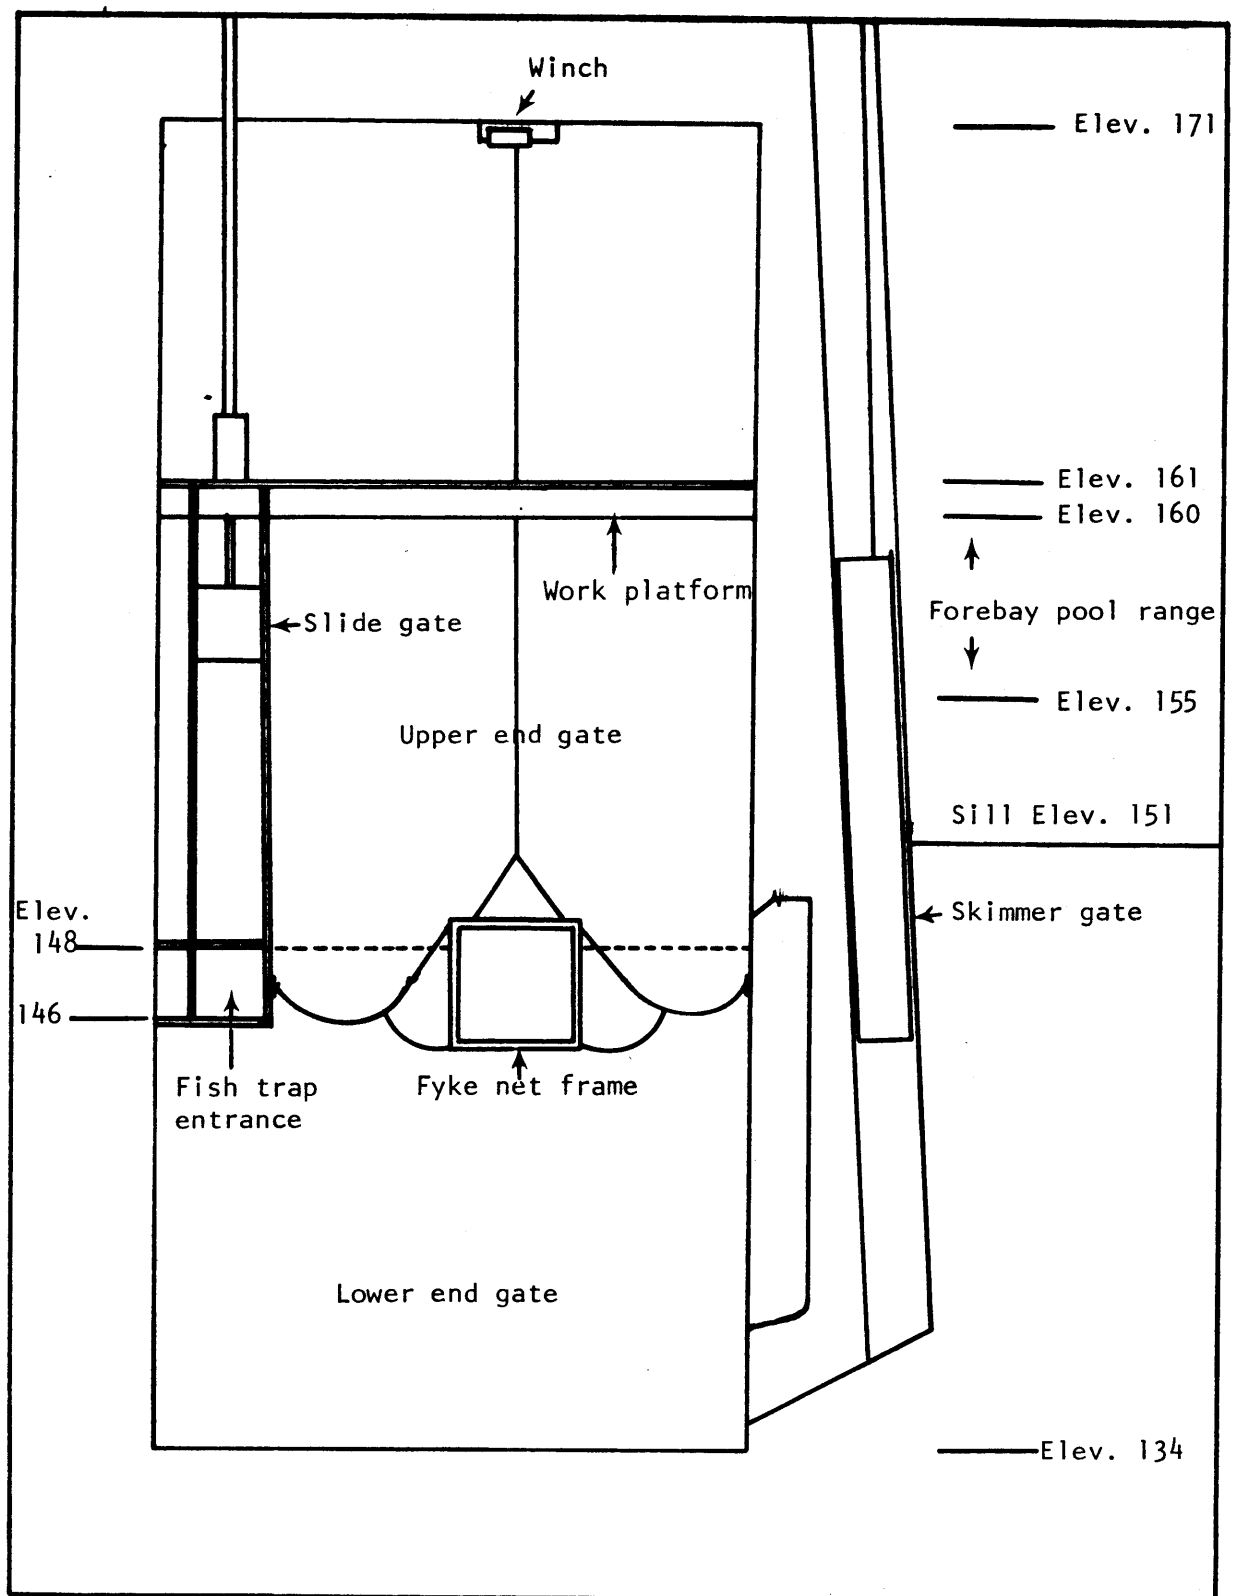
Cross sectional view of The Dalles Dam sluiceway showing fyke net and fish trap locations.
